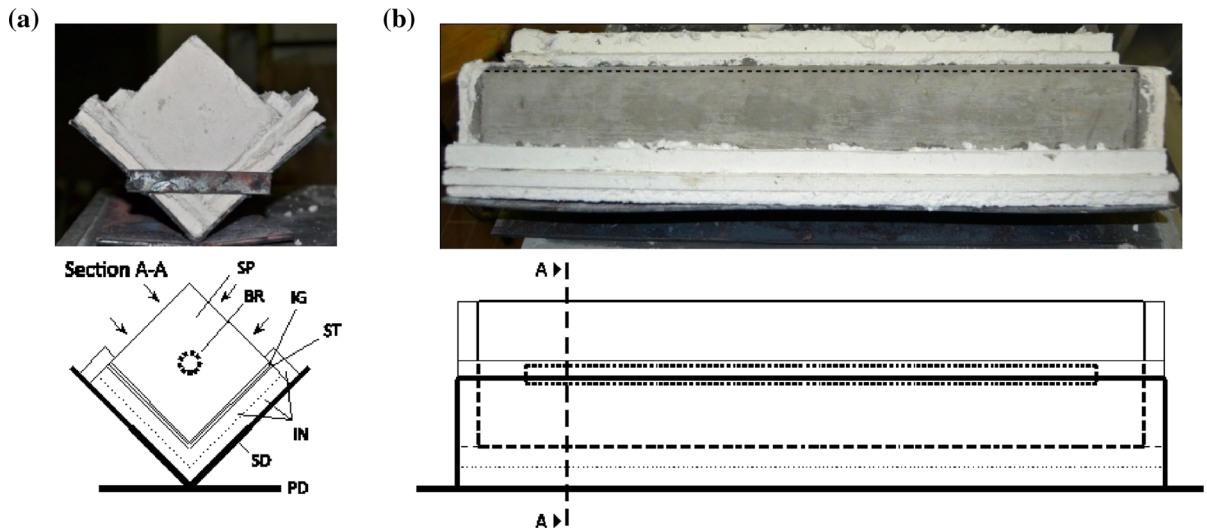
Typical specimen placed on the saddle-like support and ready to be introduced inside the furnace: front (a) and lateral view (b); *SP* specimen, *BR* bar, *IN* insulating plate, *IG
